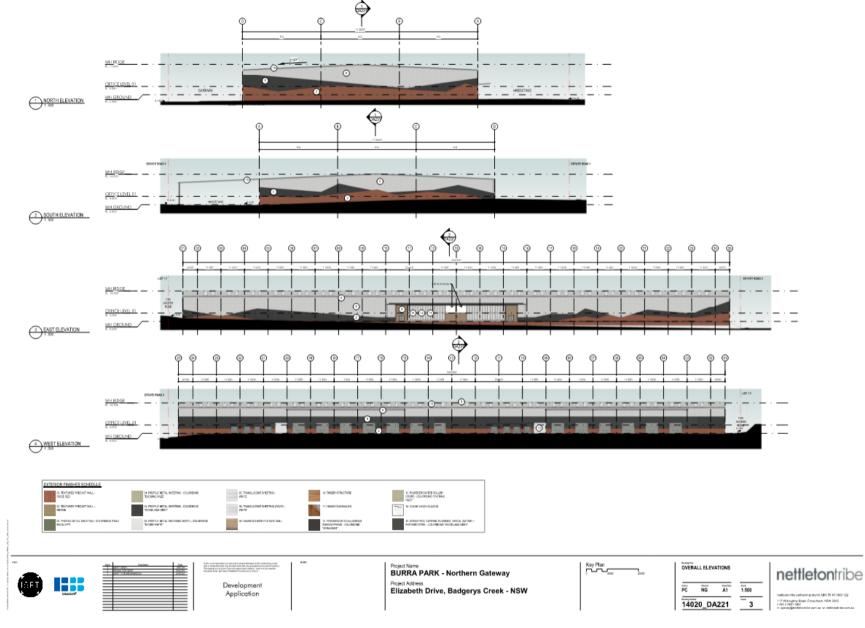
Section showing built structure on Lot 1.2 at 14.6m AGL
